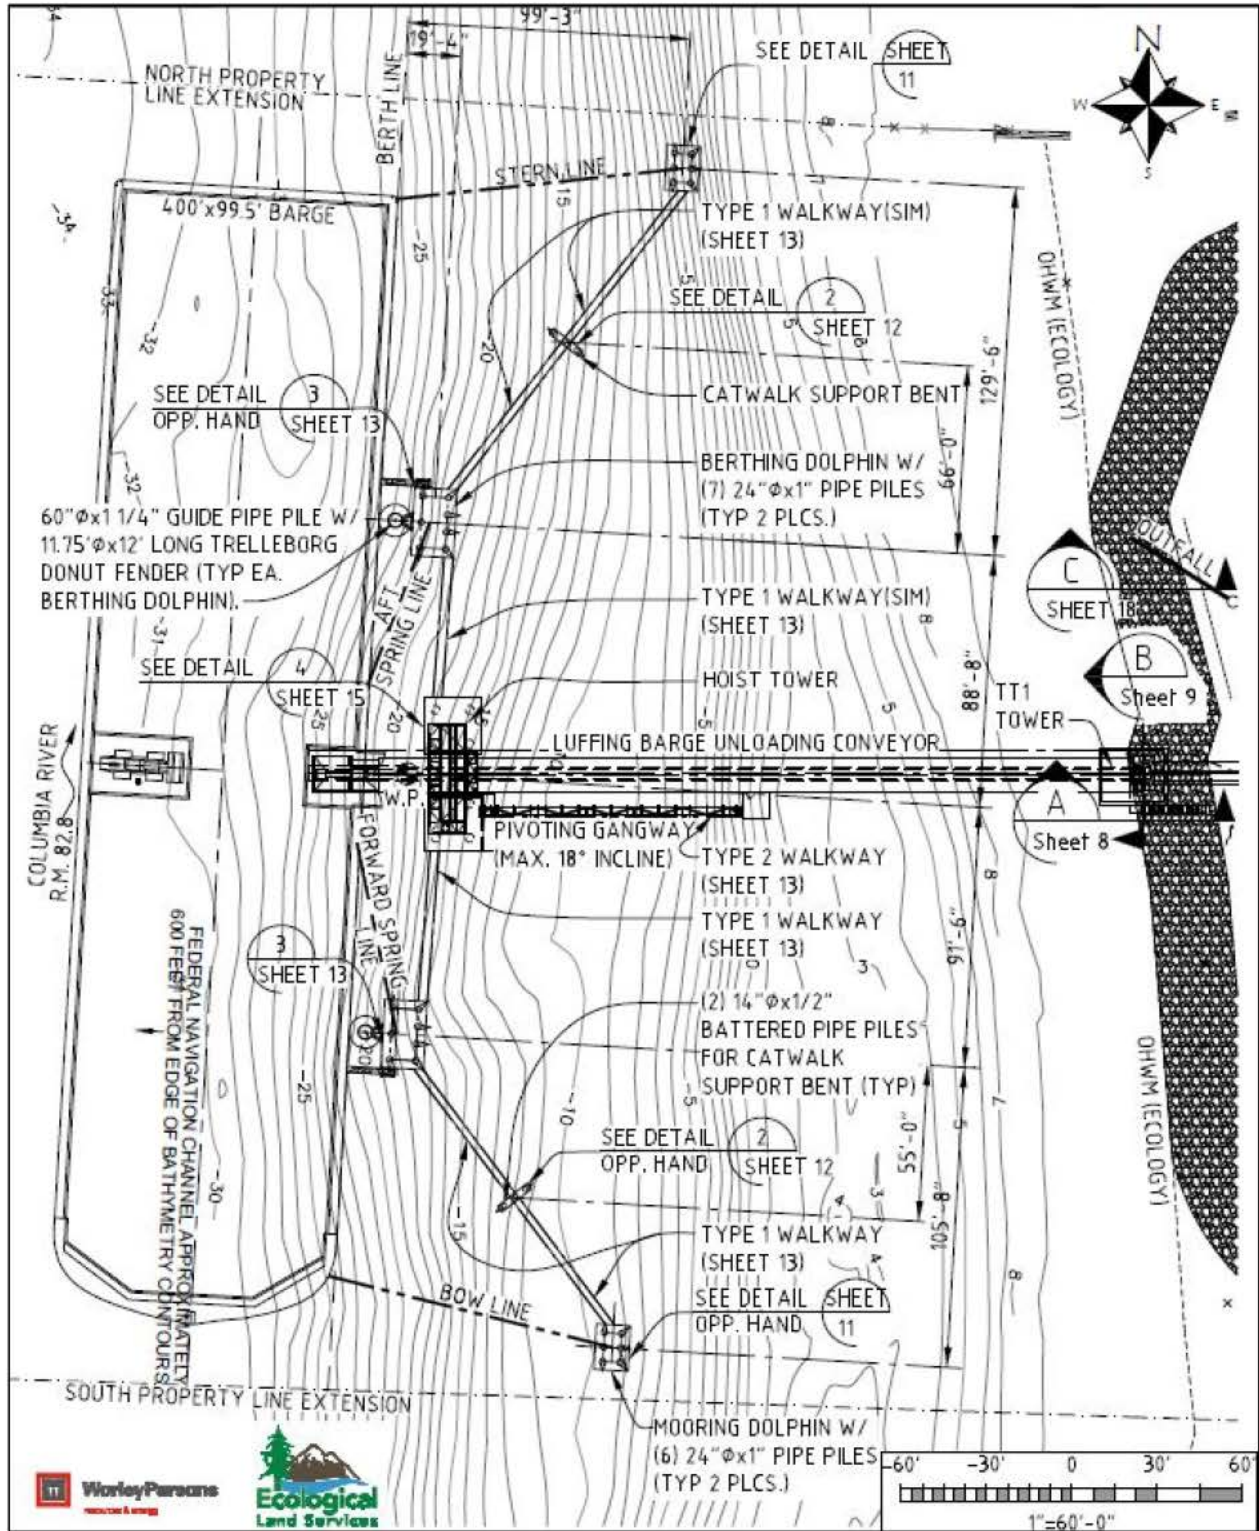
Overwater view of the proposed marine terminal (ELS 2018).
